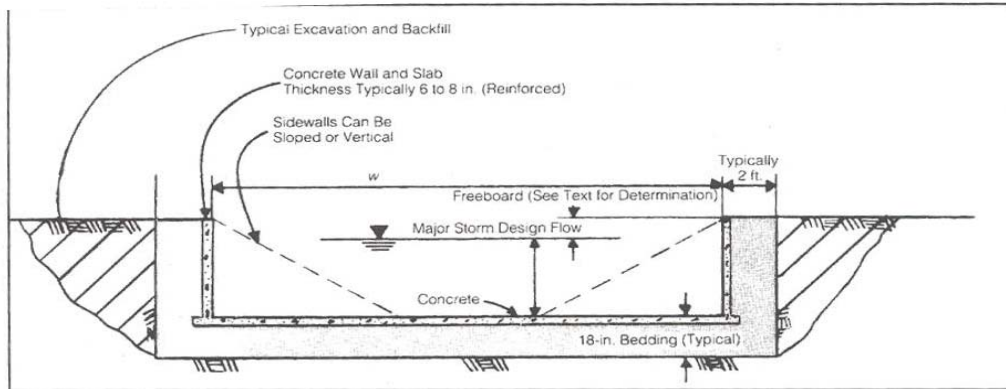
Schematic of channel with concrete lining (Source: ASCE Urban Stormwater Manual)
